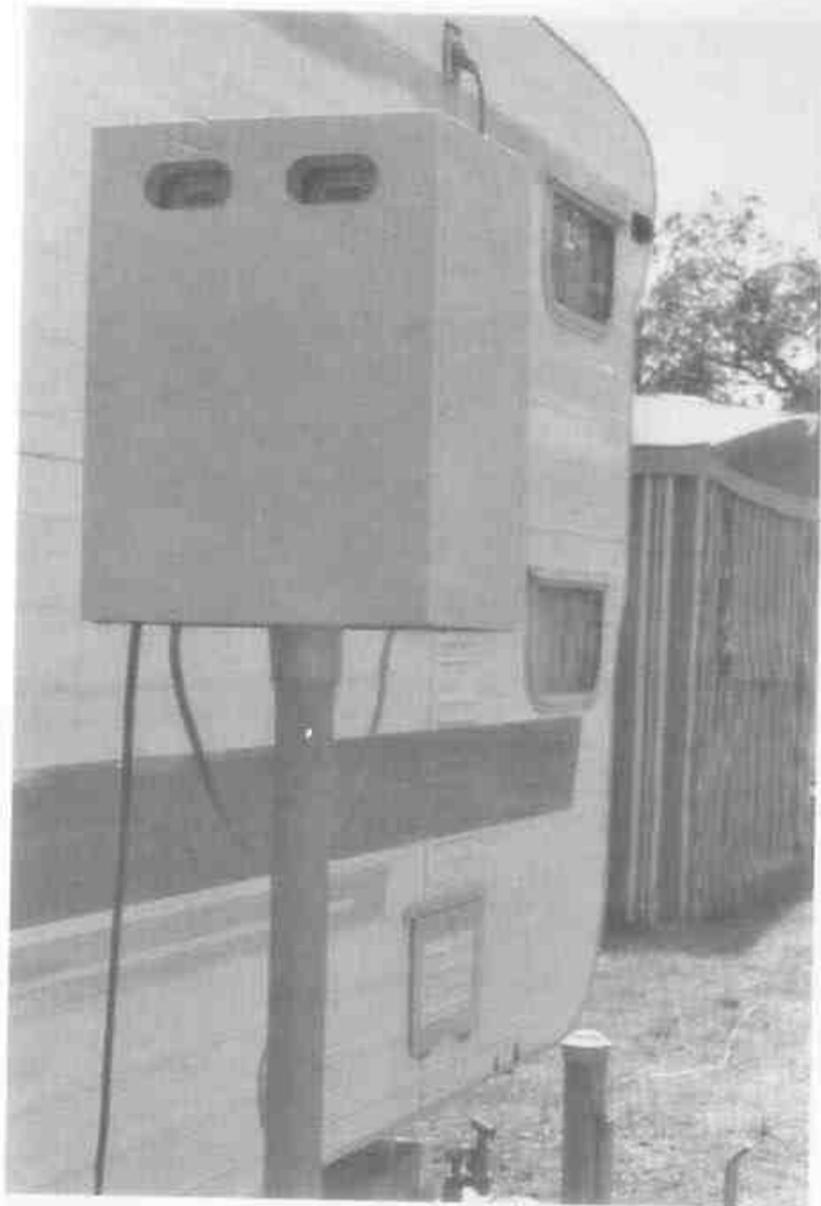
(c) Switchboard with metering and control facilities to service two caravan sites
